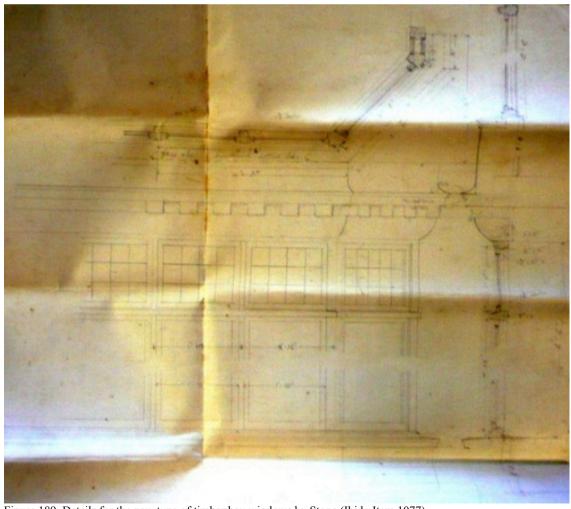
Details for the new type of timber bay windows by Stone (Ibid., Item 1077)
